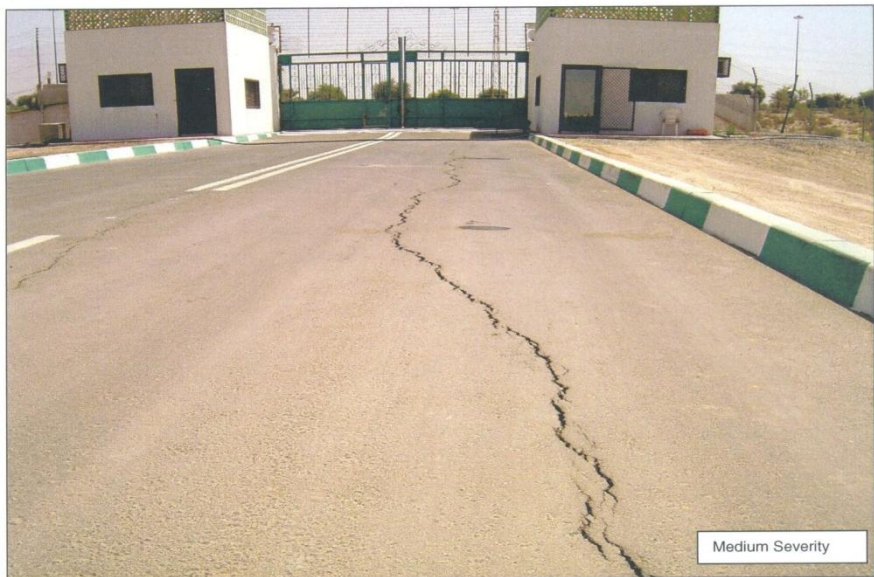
Longitudinal & Transverse Cracks (Distress Type 10)
